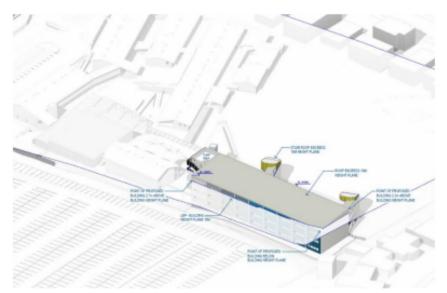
Height Plane Diagram (looking at the site from the north-east) Source: Woods Bagot
